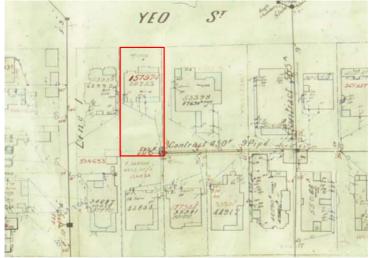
Survey plan prepared by the Board of Water Supply and Sewerage as revised in February 1935, showing the subject site outlined in red (Source: Sydney Water Archives, Blackwattle Sheet North Sydney No. 73, 650 [2])
